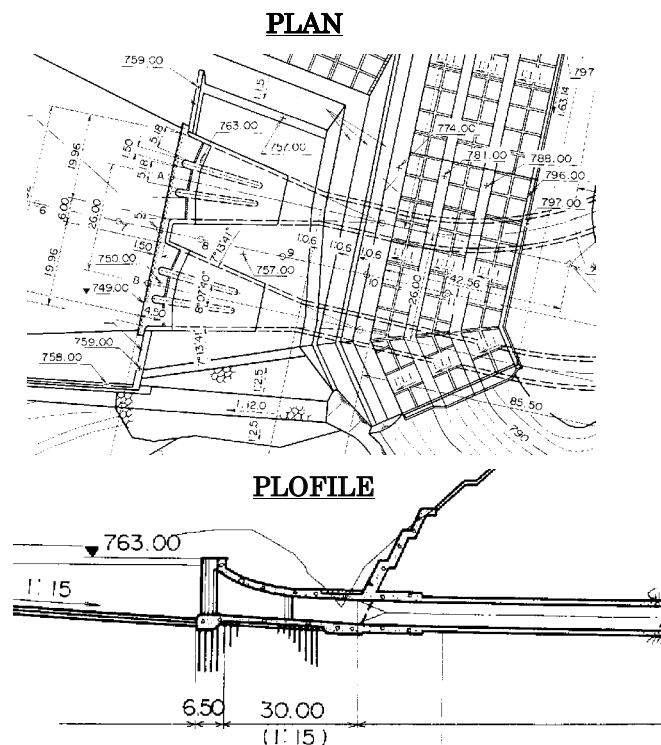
Example of Deep-Excavated Pond Dam; Typical Section
